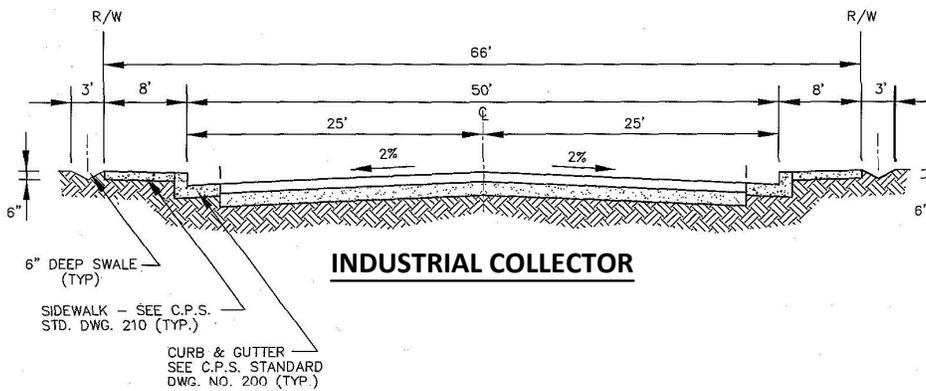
CITY OF PALM SPRINGS GENERAL PLAN ROADWAY CROSS-SECTIONS (SHEET 1 OF 2)
